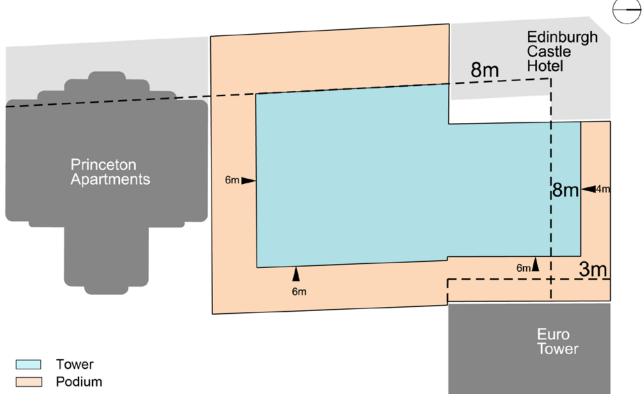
Indicative above-podium building envelope plan of Envelope Option 2
